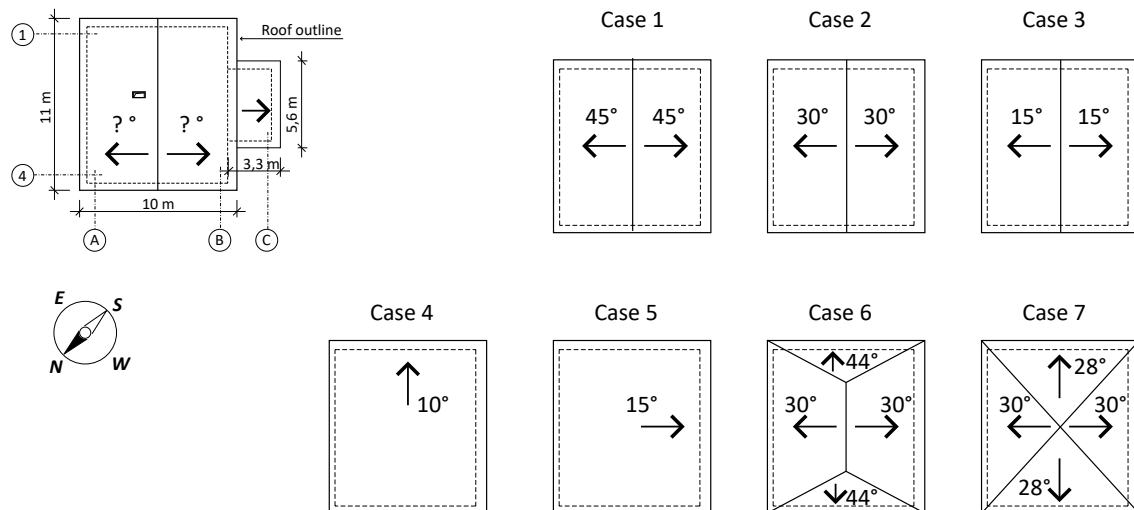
Plot plan and orientation of the typical house and the most popular roof shape and slope projects
